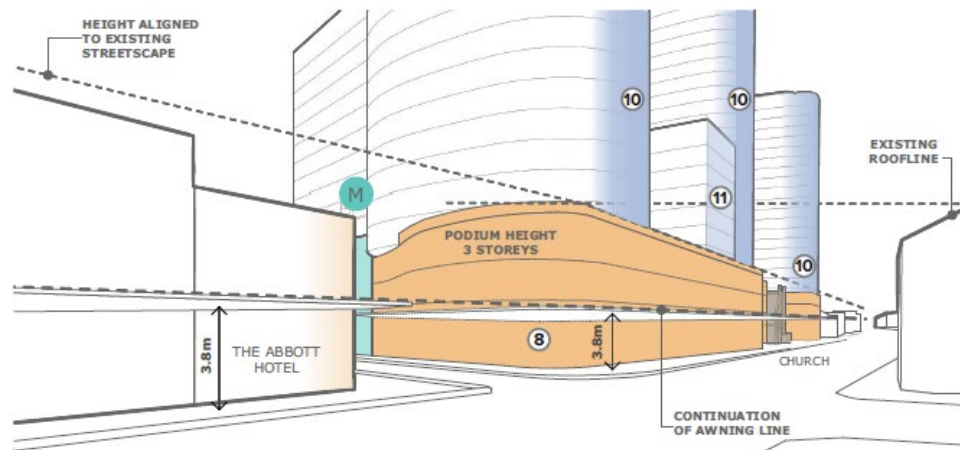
Street wall alignment (Courtesy of Turner and Turf)
